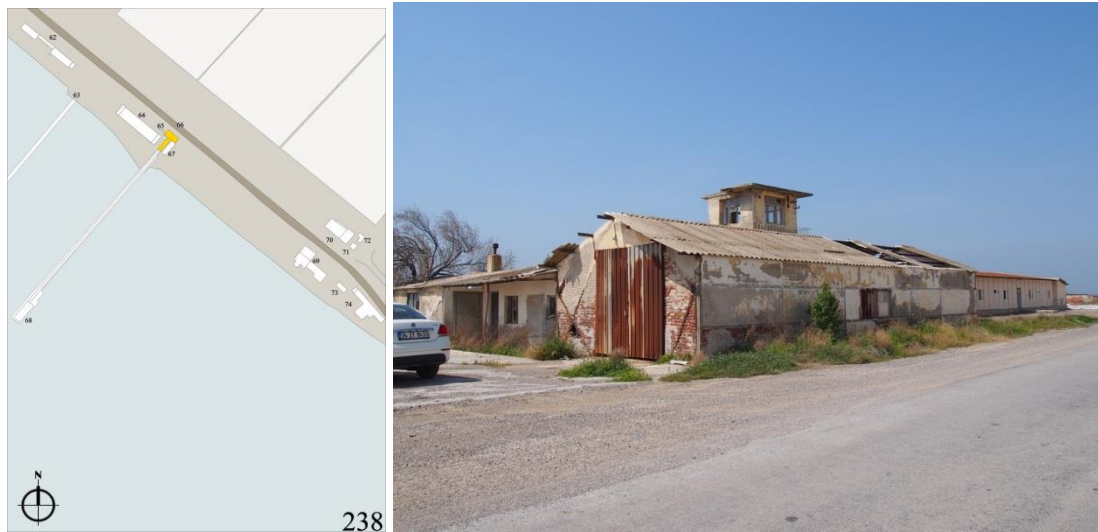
Site plan and the eastern corner of the port building 1 (Author, April 2016)
